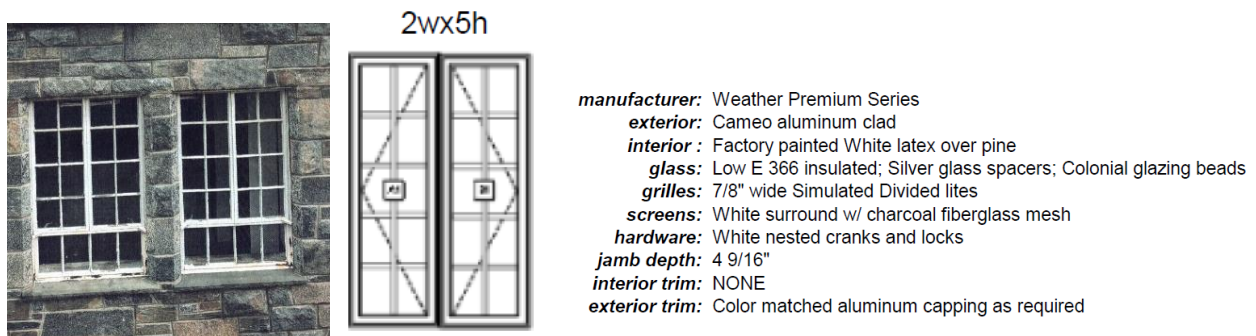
Existing steel windows on the tower (left); and proposed clad casement windows specifications (right).
